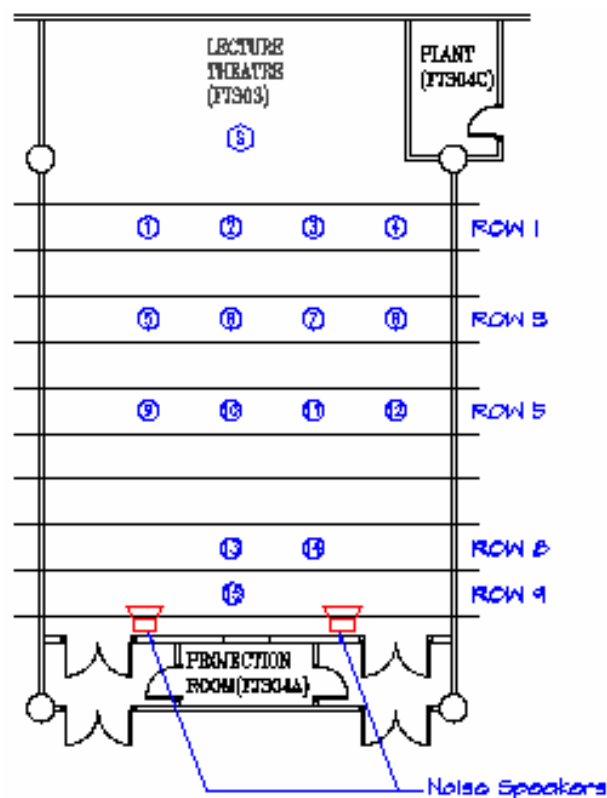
Layout of the speech intelligibility testing equipment in room FJ303.
